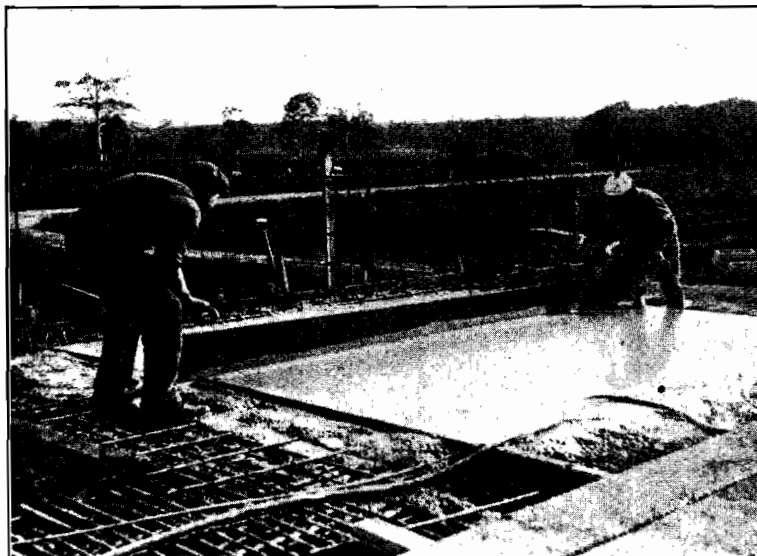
Screeding Concrete Deck at Rosedale.
